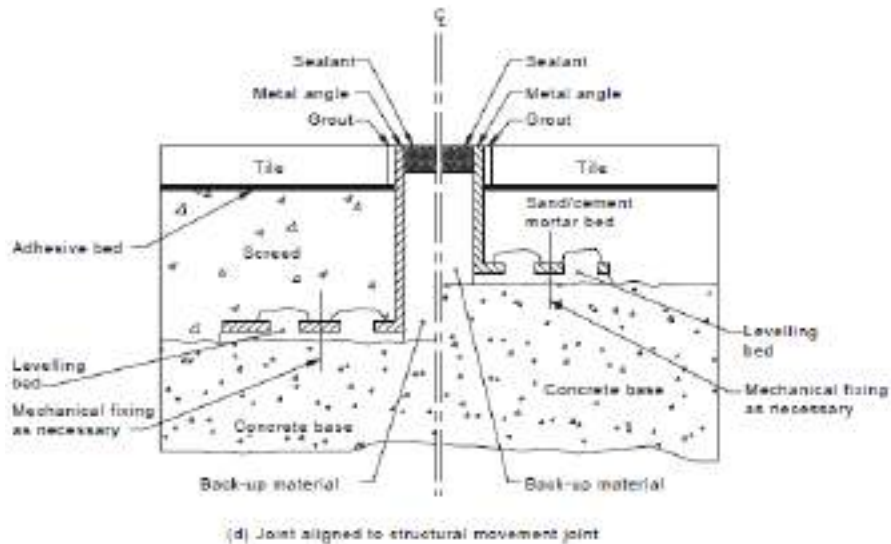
(in part) TYPICAL MOVEMENT JOINT SYSTEMS FOR FLOORS
